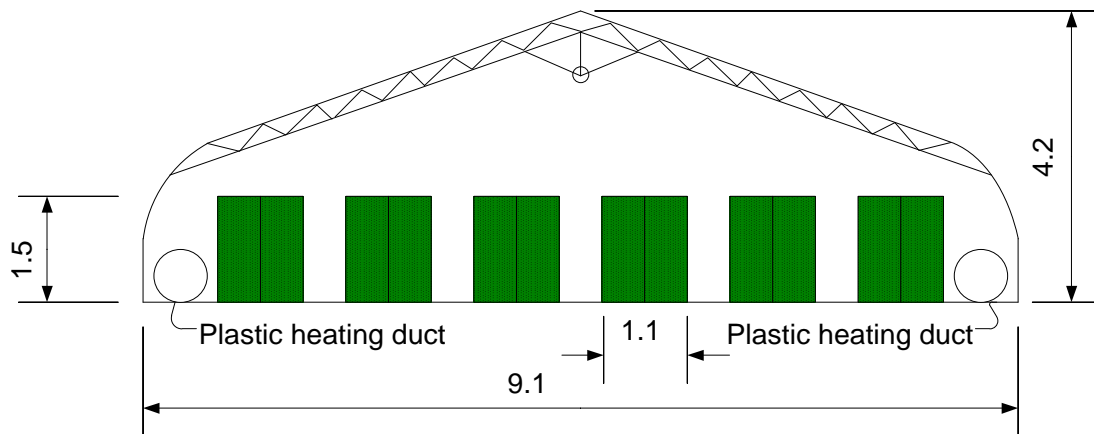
Sketch of the greenhouse cross section (dimensions in m).
